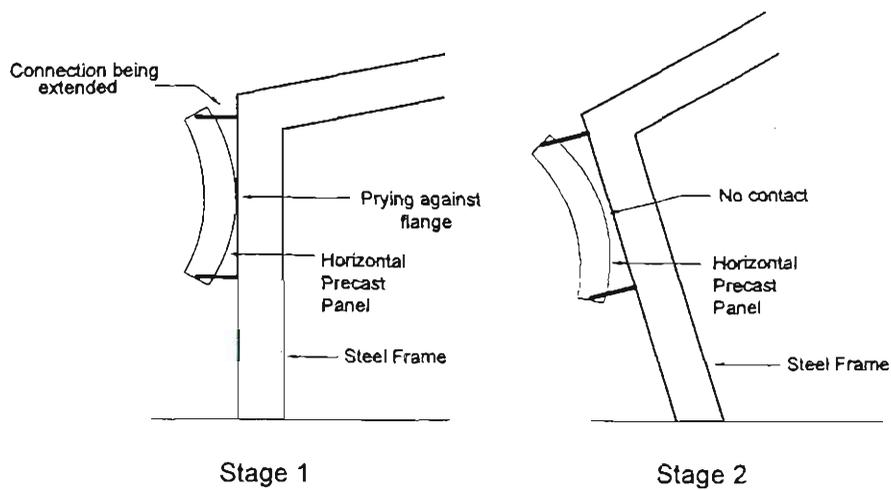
Interaction Between Deforming Horizontal Panel and Steel Frame
